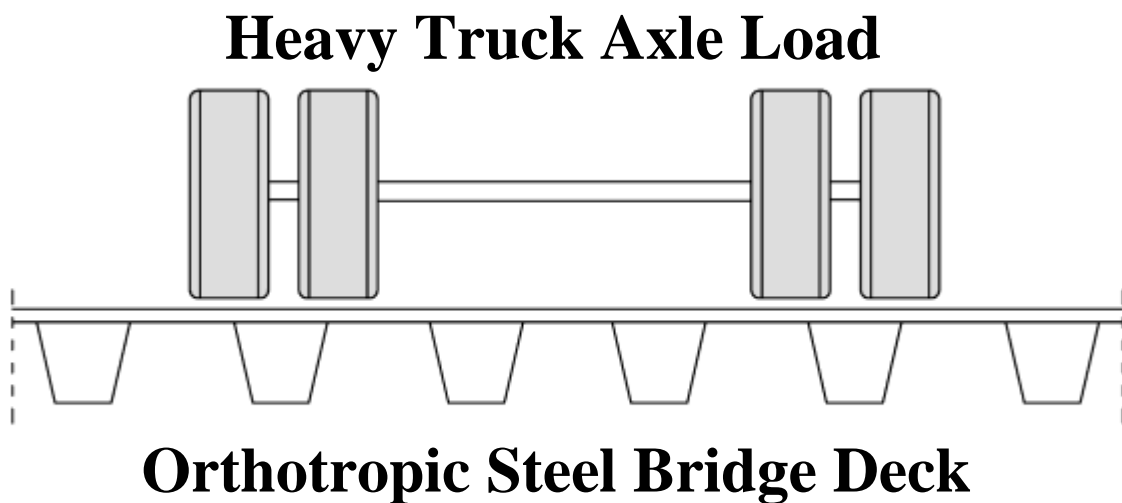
Traffic loading on steel orthotropic bridge decks
